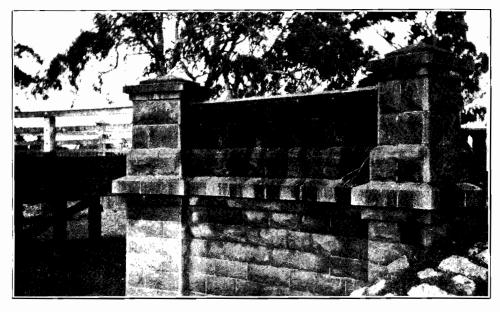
Showing fine example of bridge abutment and wing wall at Cavendish.
